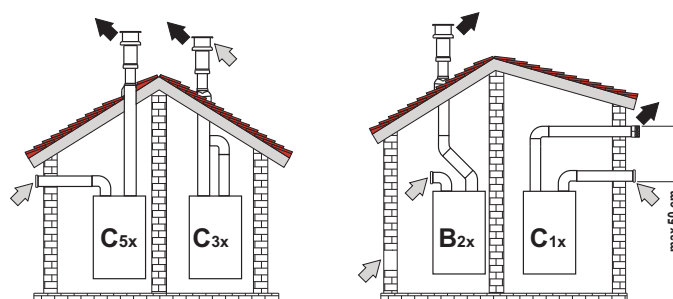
Examples of connection with separate pipes (↔ = Air / ➔ = Fumes)
